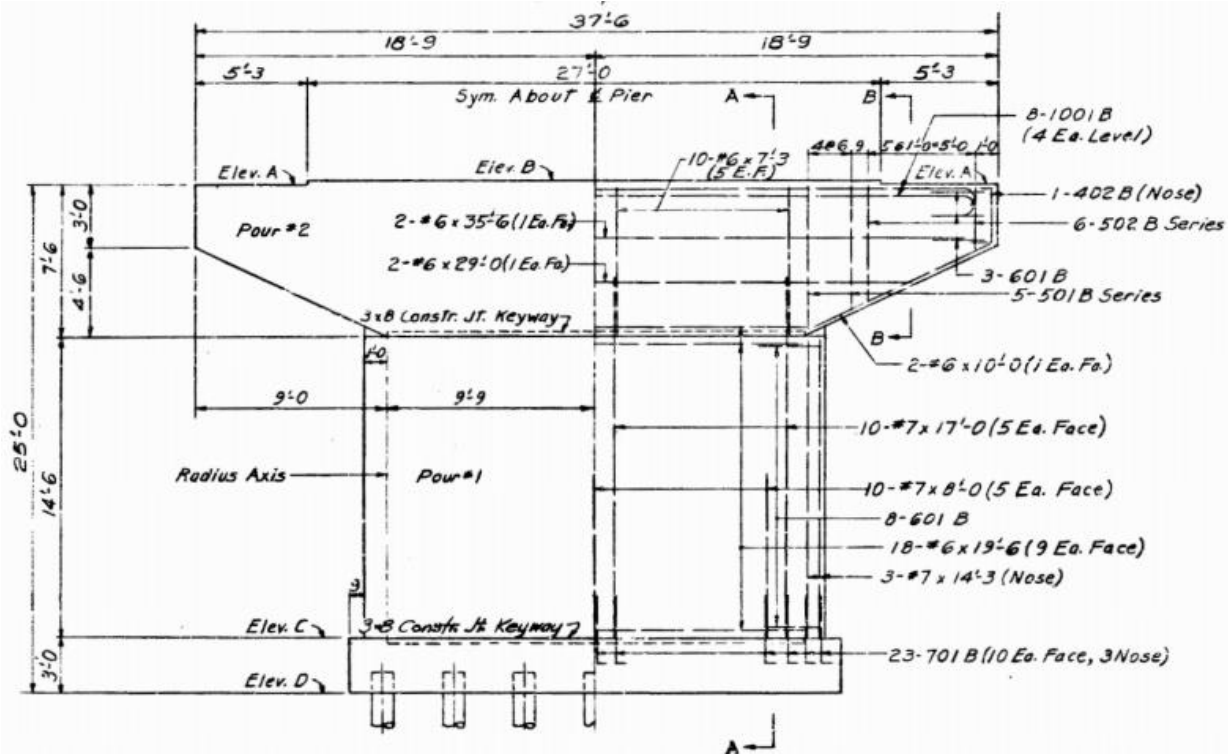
System A: Transverse Elevation of an Interior Pier (NBI 33240) (1978)
